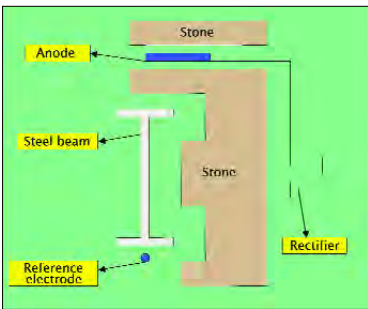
Schematic diagram for cathodic protection of stone clad steel framed buildings.
